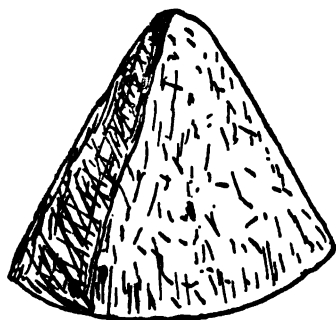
SIZE AND SHAPE OF STONE FOR BROKEN-STONE PAVEMENTS.
